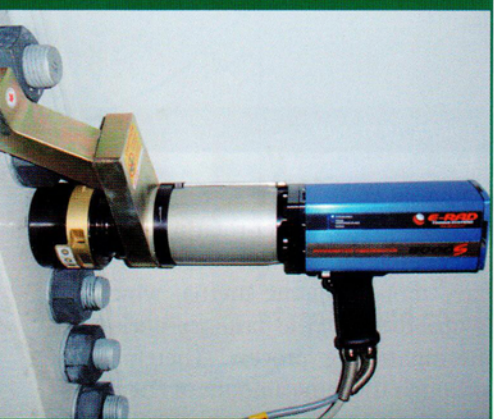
Tower flange – tightening M48 bolts at 6,500NM
